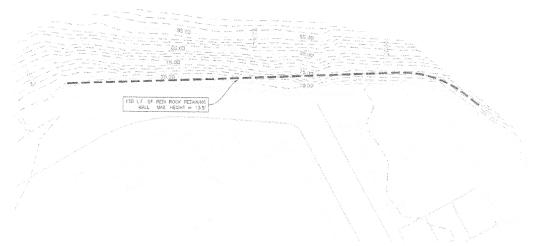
13.5' Redi-Rock retaining wall alignment with minimal setback.
